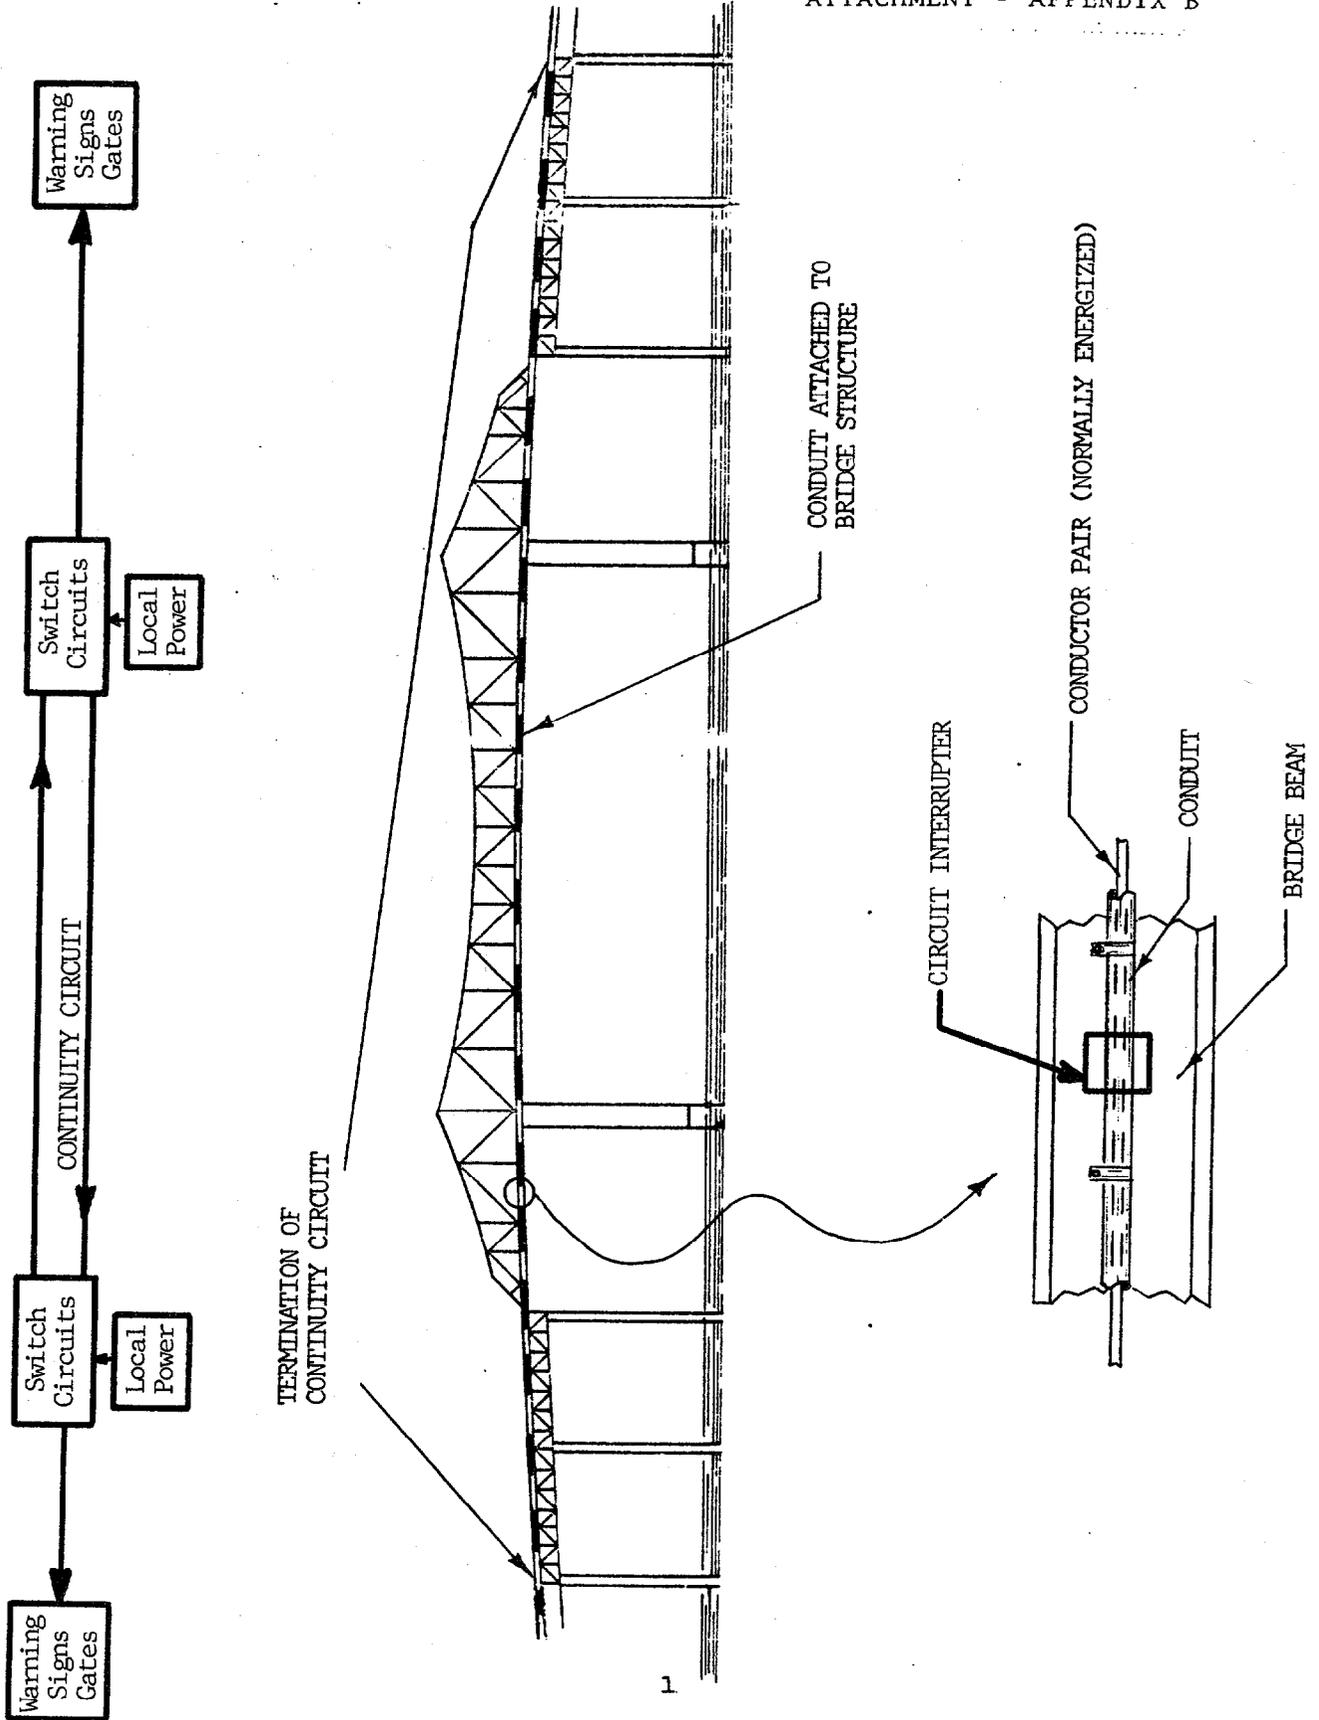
BRIDGE CONTINUITY SYSTEM FOR SUNSHINE SKYWAY BRIDGE
